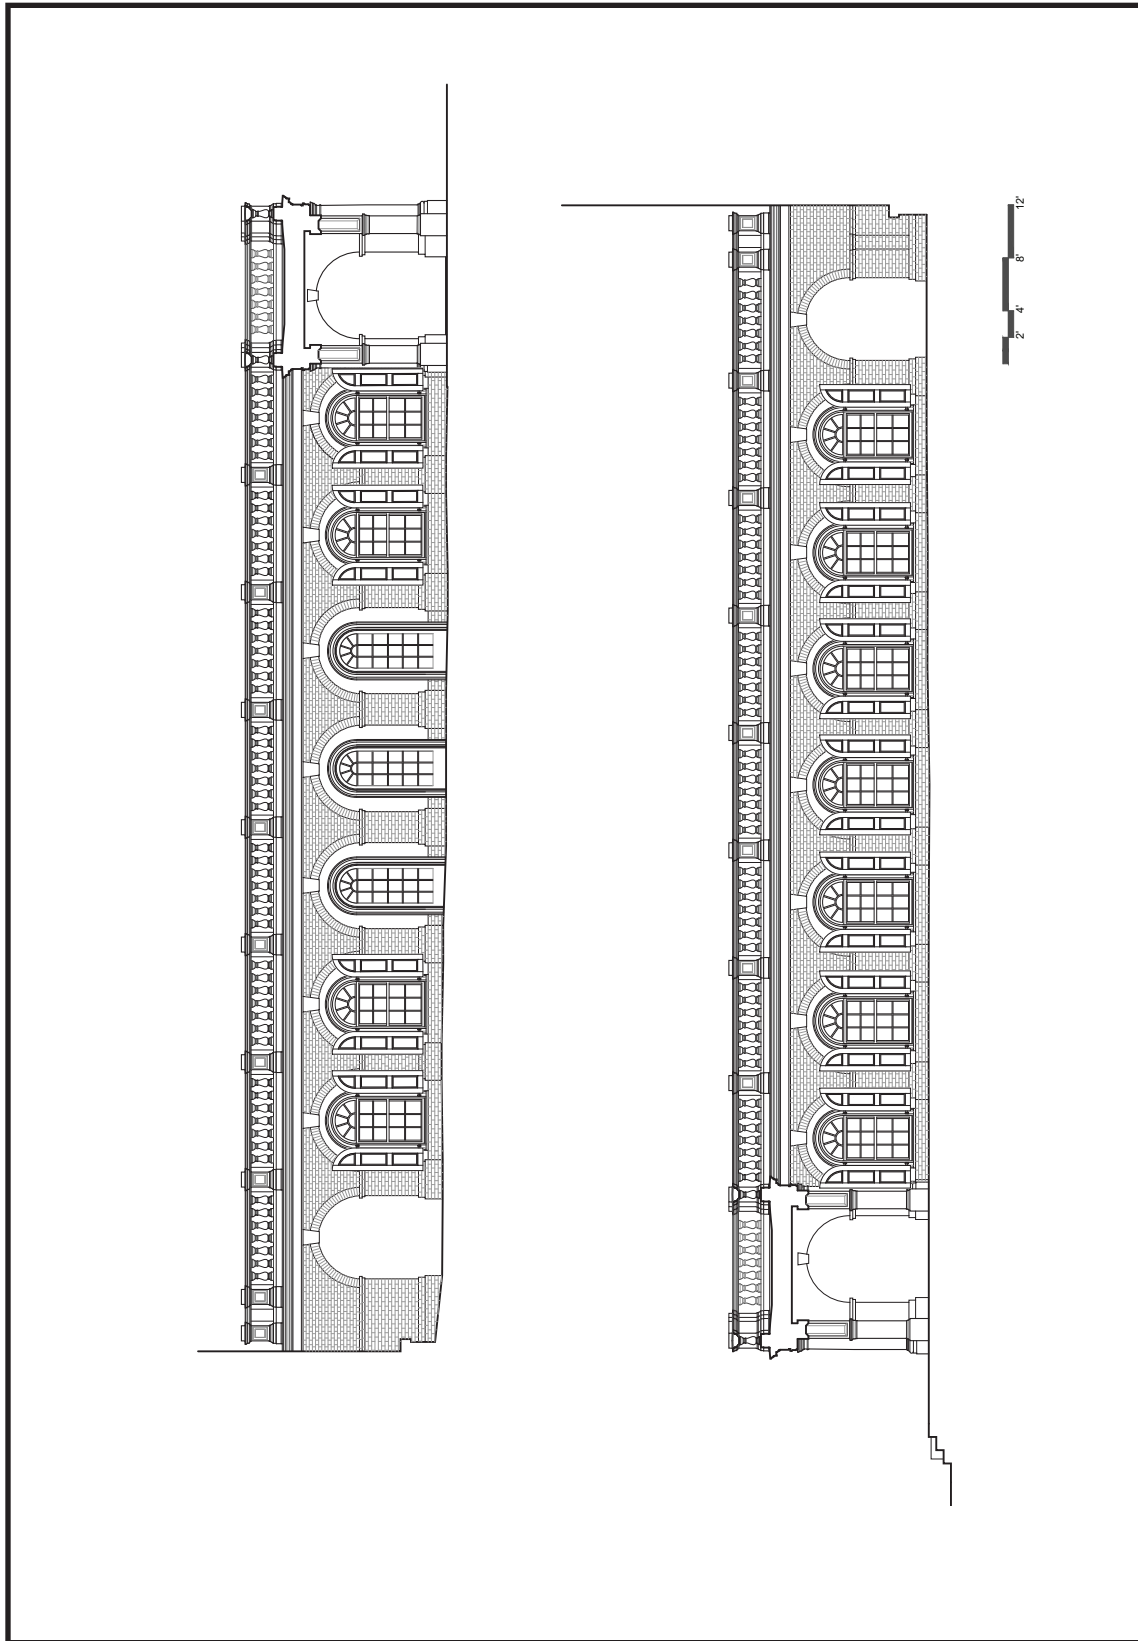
North elevations, southwest wing, west courtyard (top); and southeast wing, east courtyard (bottom). Drawings by John G. Waite Associates, Architects, 2022.
